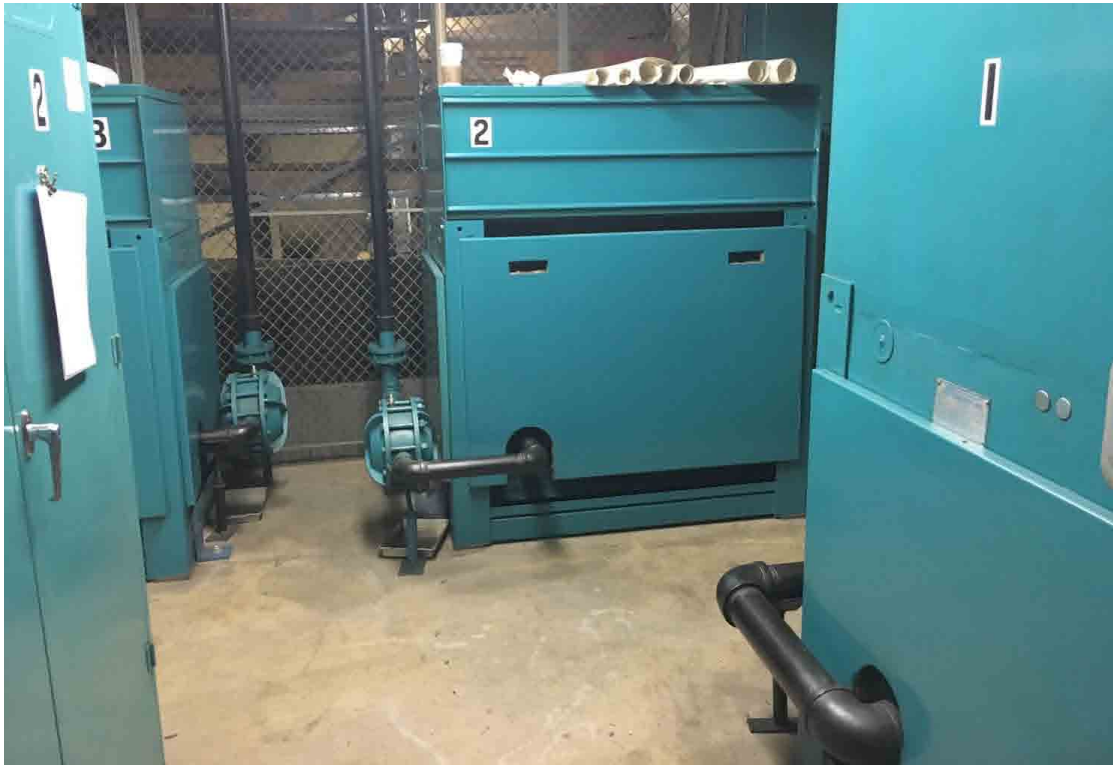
Elevator equipment room in the mezzanine of the original west facility
